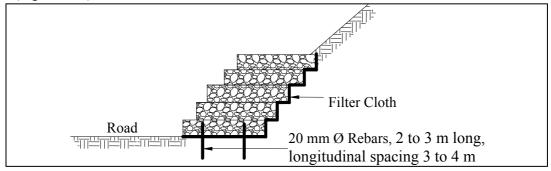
Example of Gabion Wall on the Foot of a Slope
